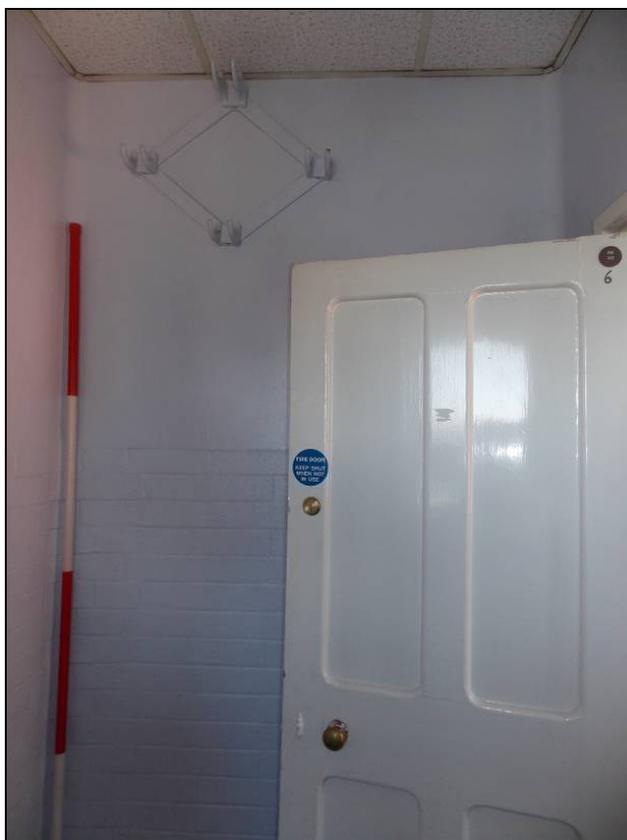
Cylindrical bracket within the Store Room, looking west (scale 2m).
